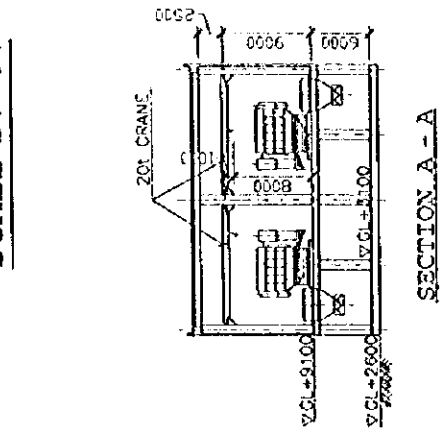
PROPOSED LAYOUT OF CENTRIFUGAL THICKENER
